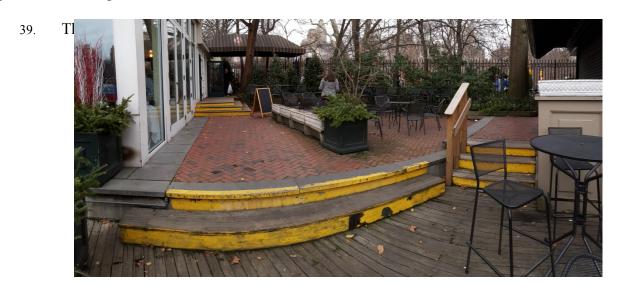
Photograph of Outdoor Amenities; visible are steps from Boardwalk to Brick Patio, from each of those to Outdoor Bar, and from the Patio to the Side Entrance, as well as the Patio Doors to the Lower Dining Area. Taken Dec. 26, 2015.
